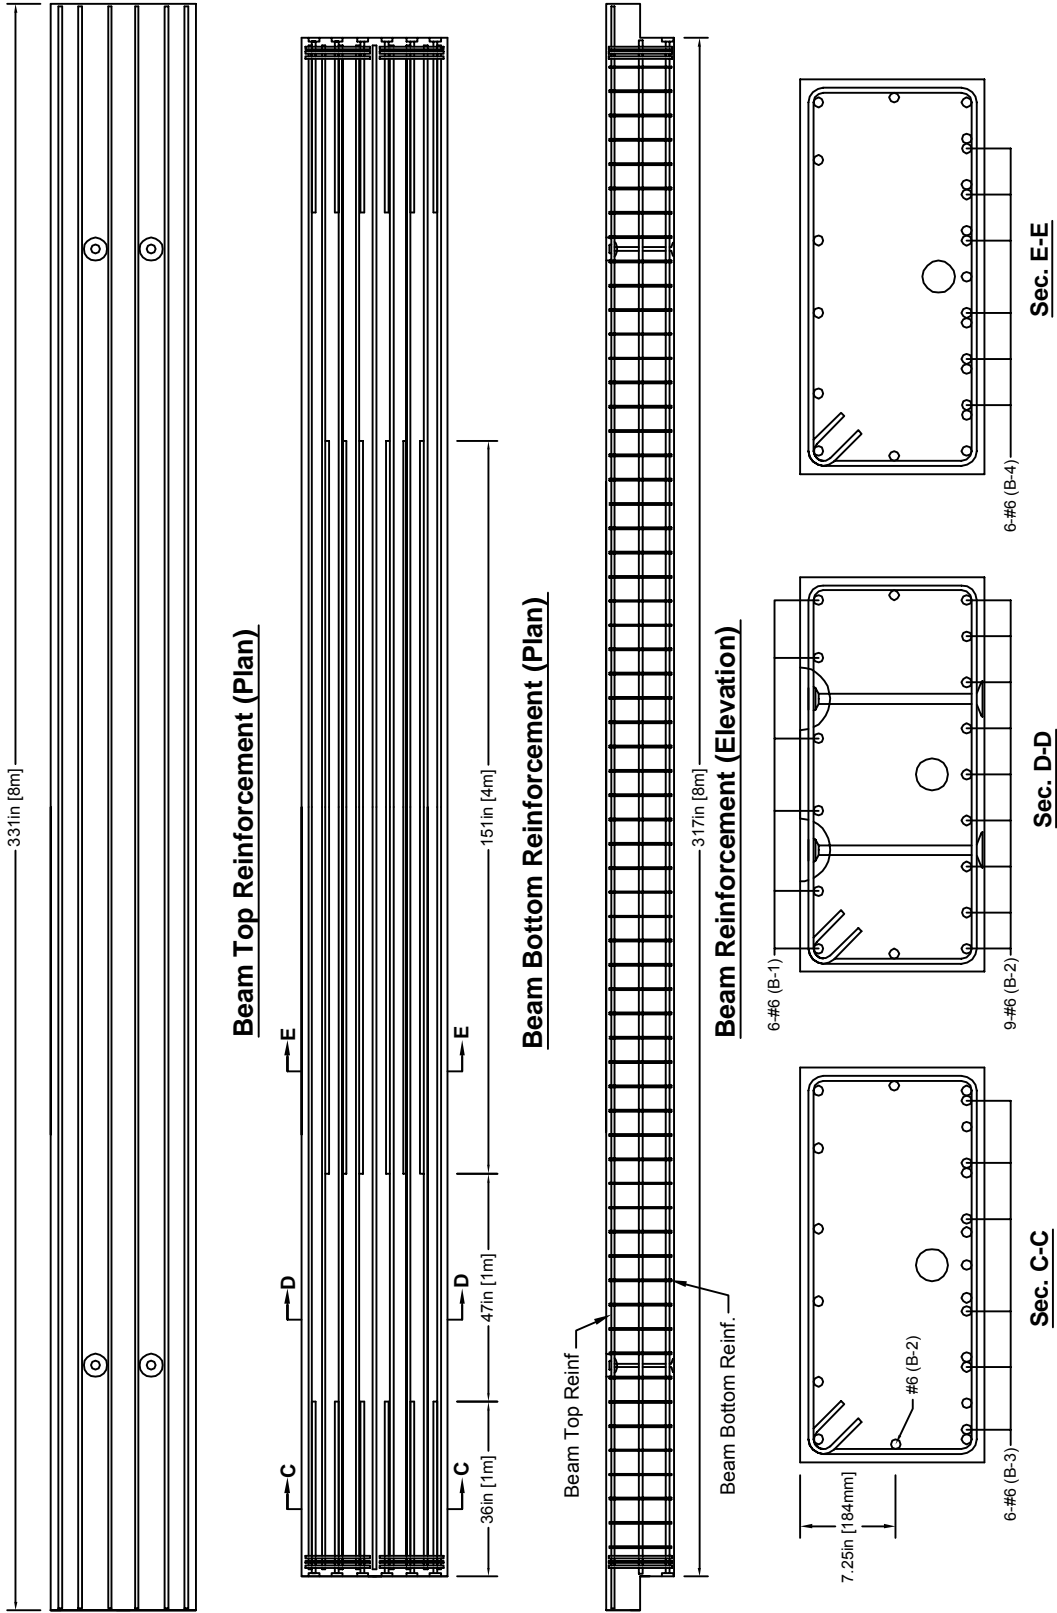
Bridge Plans Sheet 14; Beam Longitudinal Steel.
